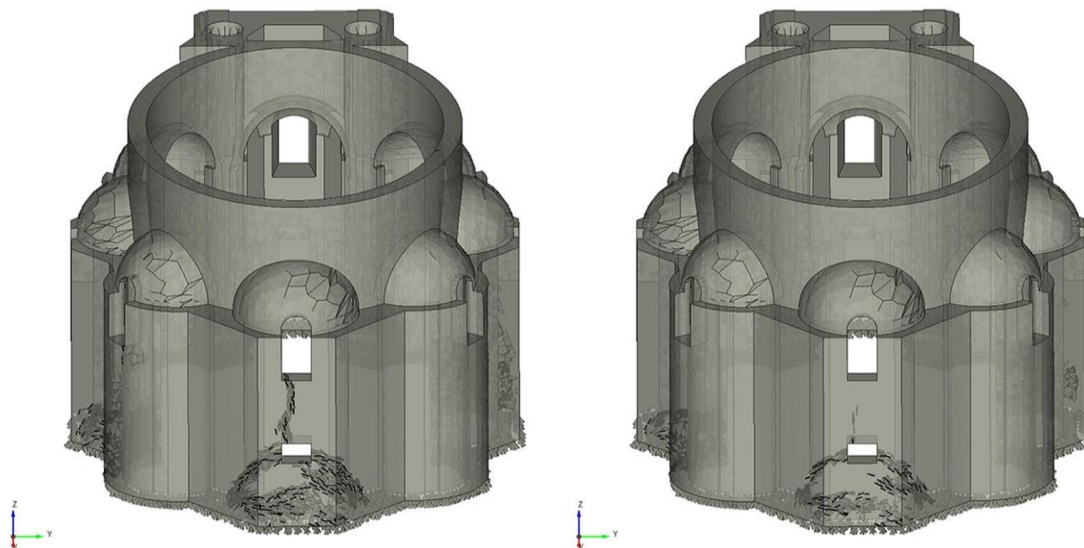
Filtered crack width showing (a) 5mm (Moderate), and (b) 15 mm (Severe) degree of damage
